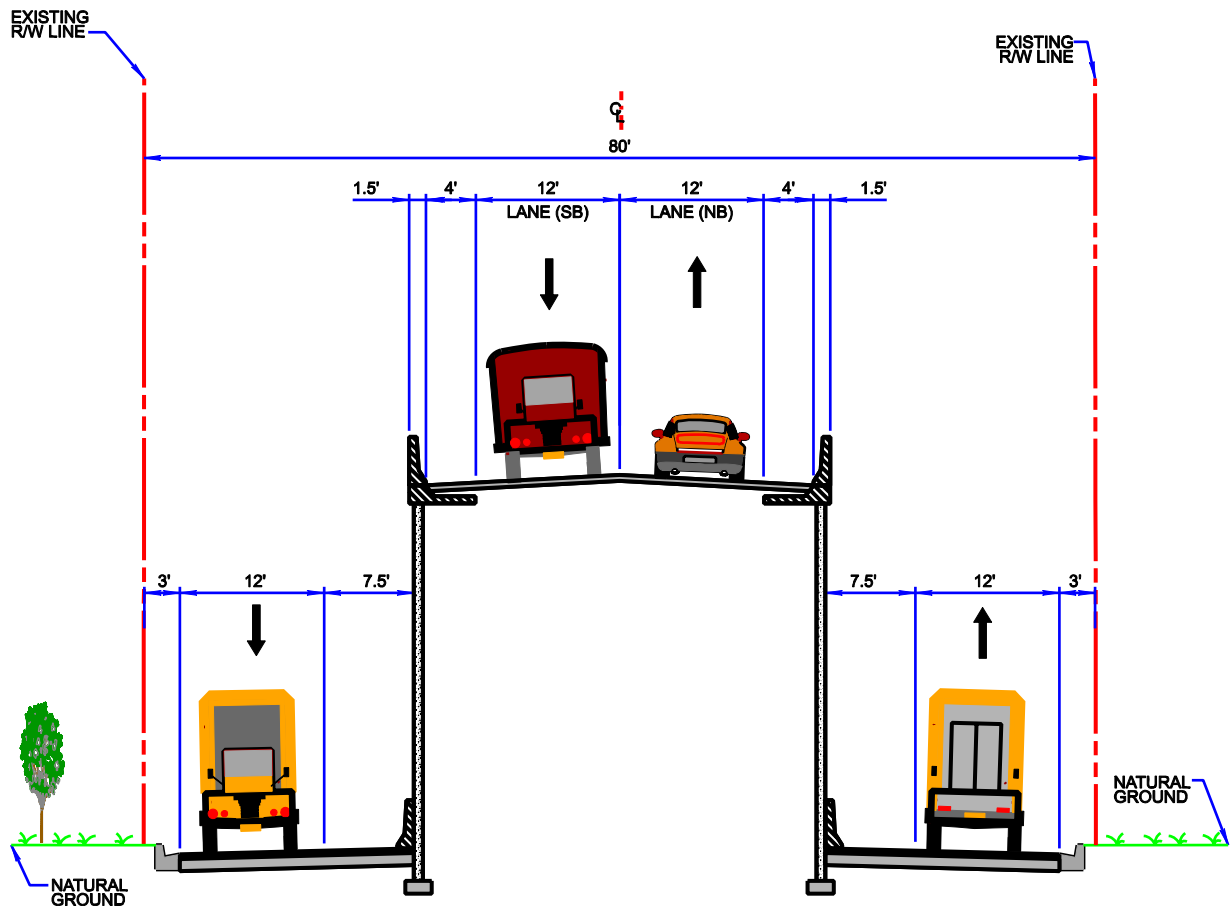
E NW 107th Avenue approach to FEC Railroad (2008)
